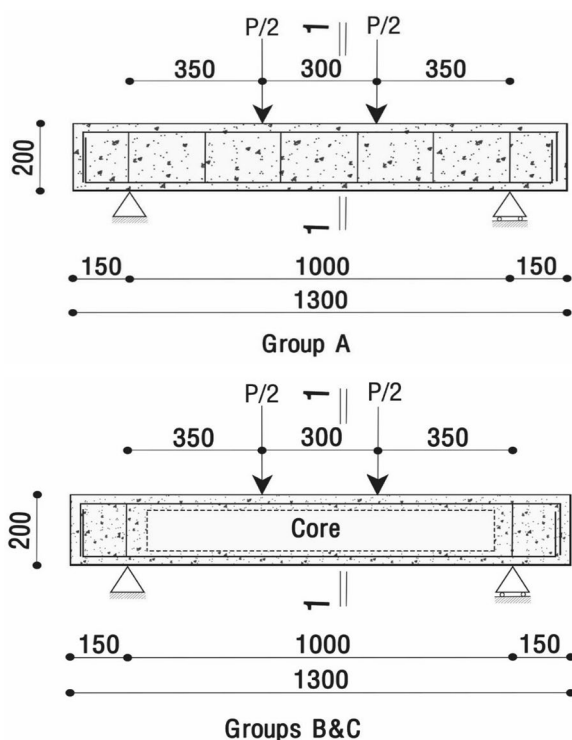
Typical dimensions and reinforcement of the tested specimens (all measurements are in mm)
